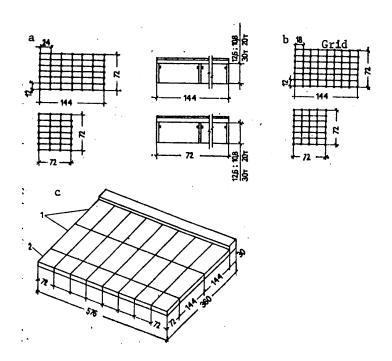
Examples of dimensioned layouts of unitized standard sections of one-story production buildings. a--With column grid of 24 x 12 m; b--with column grid of 18 x 12 m; c--versions of the layout of buildings from standard sections of modules: 1--basic sections; 2--auxiliary sections.
